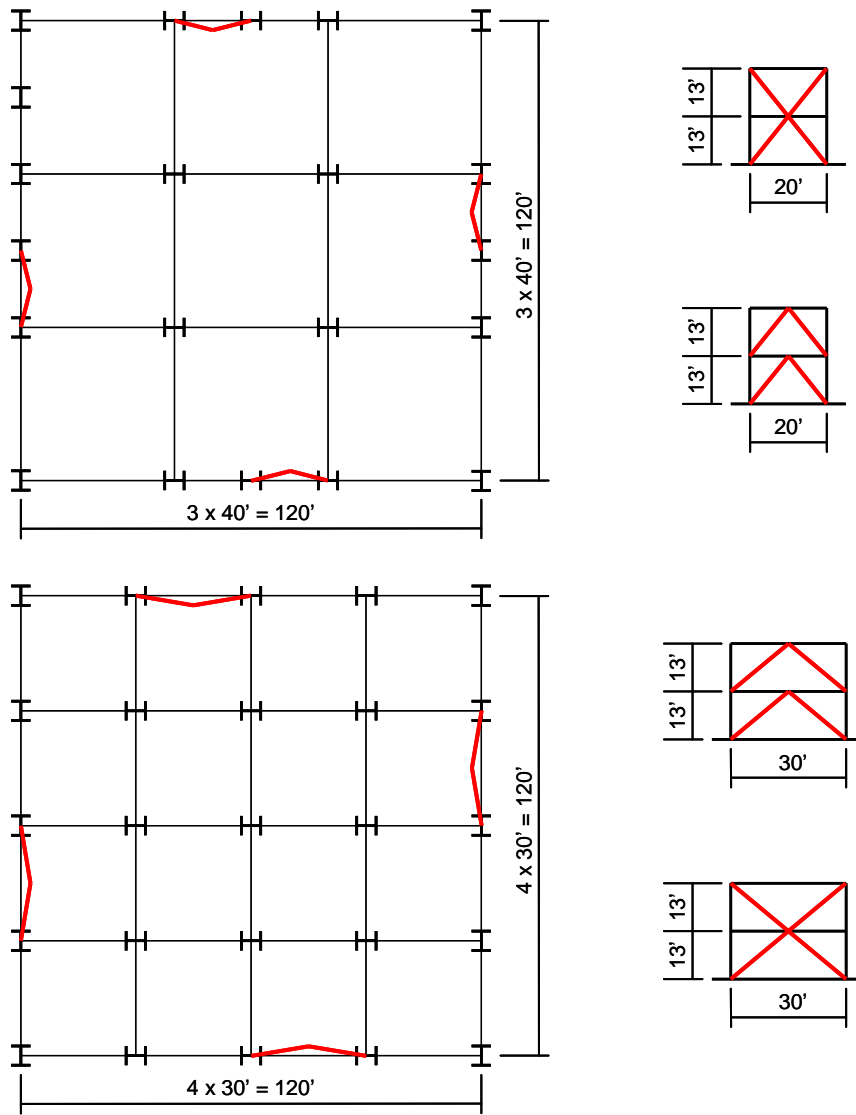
Plan configurations for chevron and X-brace configurations illustrated for 2-story archetypes with bay widths of 20 feet and 30 feet.
